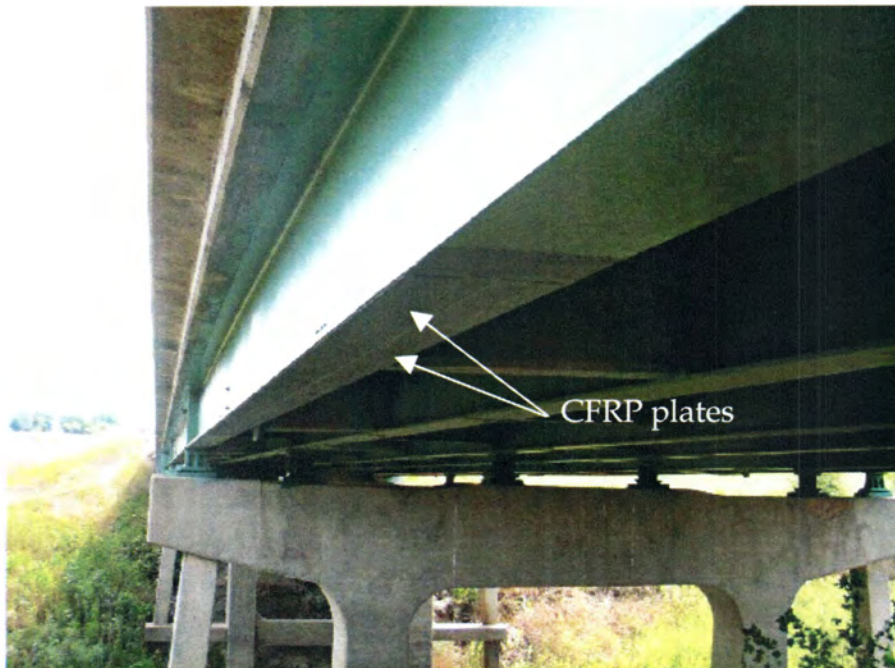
Placement of CFRP plate on top of Beam 6 bottom flange.
